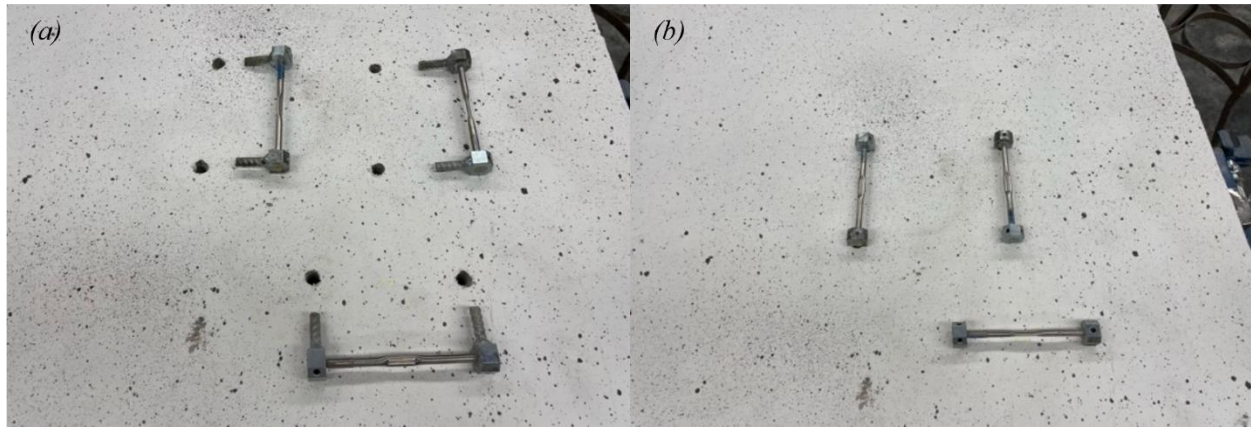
a) Strain gauges with mounting blocks ready for epoxy and b) installed strain gauges
